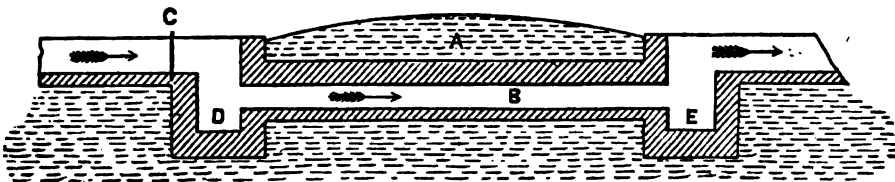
is a longitudinal section of a masonry syphon under a road. The shaded portions are masonry in section. A is the roadway; B the channel through which the water flows; C grating to prevent the entry of rubbish into the syphon; D and E are wells constructed to receive the silt carried down by the water. The arrows indicate the direction in which the water flows. Scale 8 feet = 1 inch.
